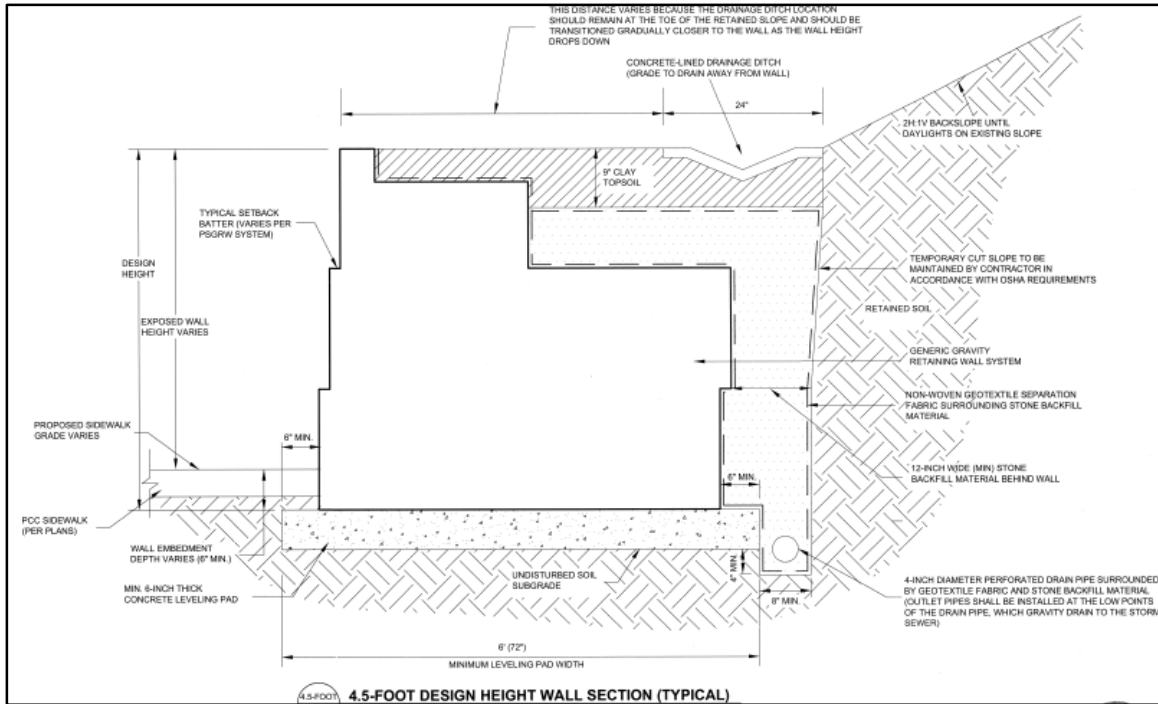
Diagram. Typical section of 4.5-foot precast retaining wall.
